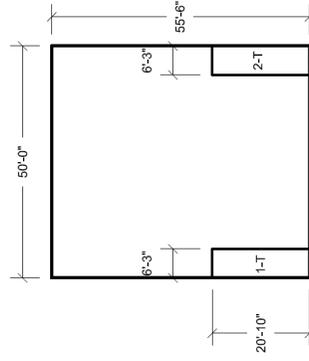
H.6-118. COOLING TOWER WEST WALL LOOKING EAST
